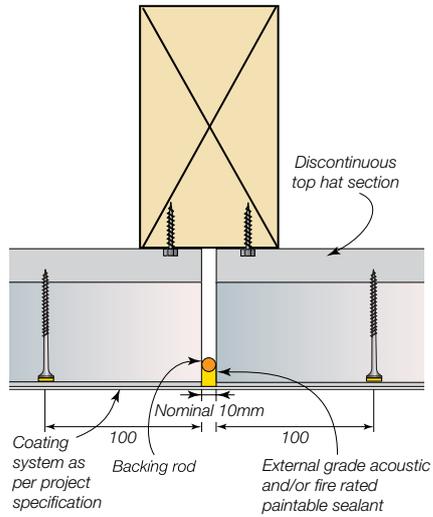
Horizontal control joint – Brick veneer to STAAC WALL® - Option 1
